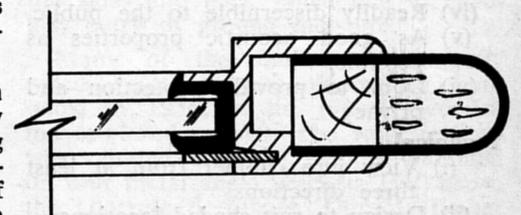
Section Through Door style showing "Neoprene" Glazing Strip Rubber and Buffer Strip.
